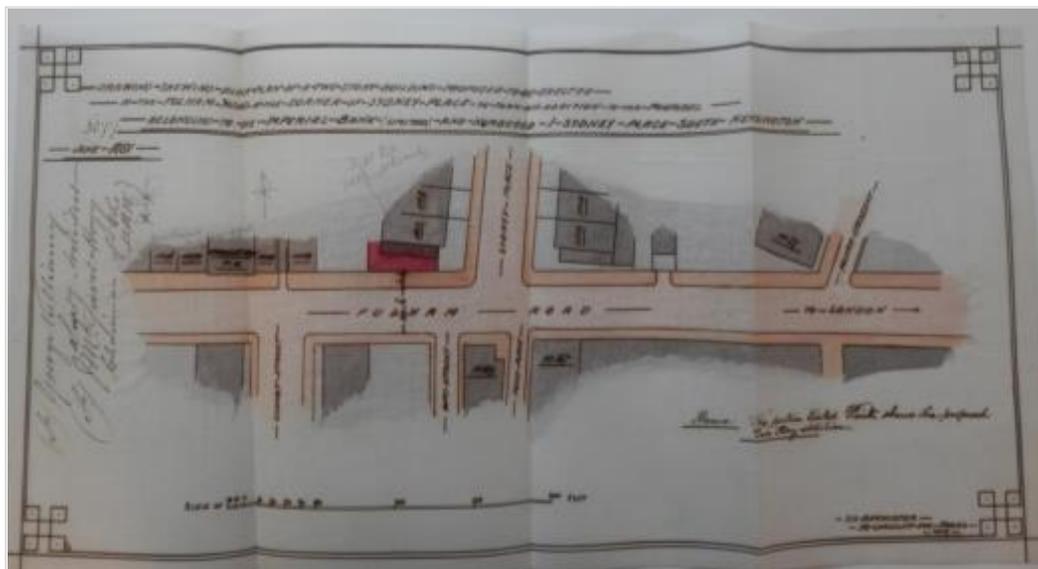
Block plan illustrating proposed extension to the south side of 1 Sydney Place
